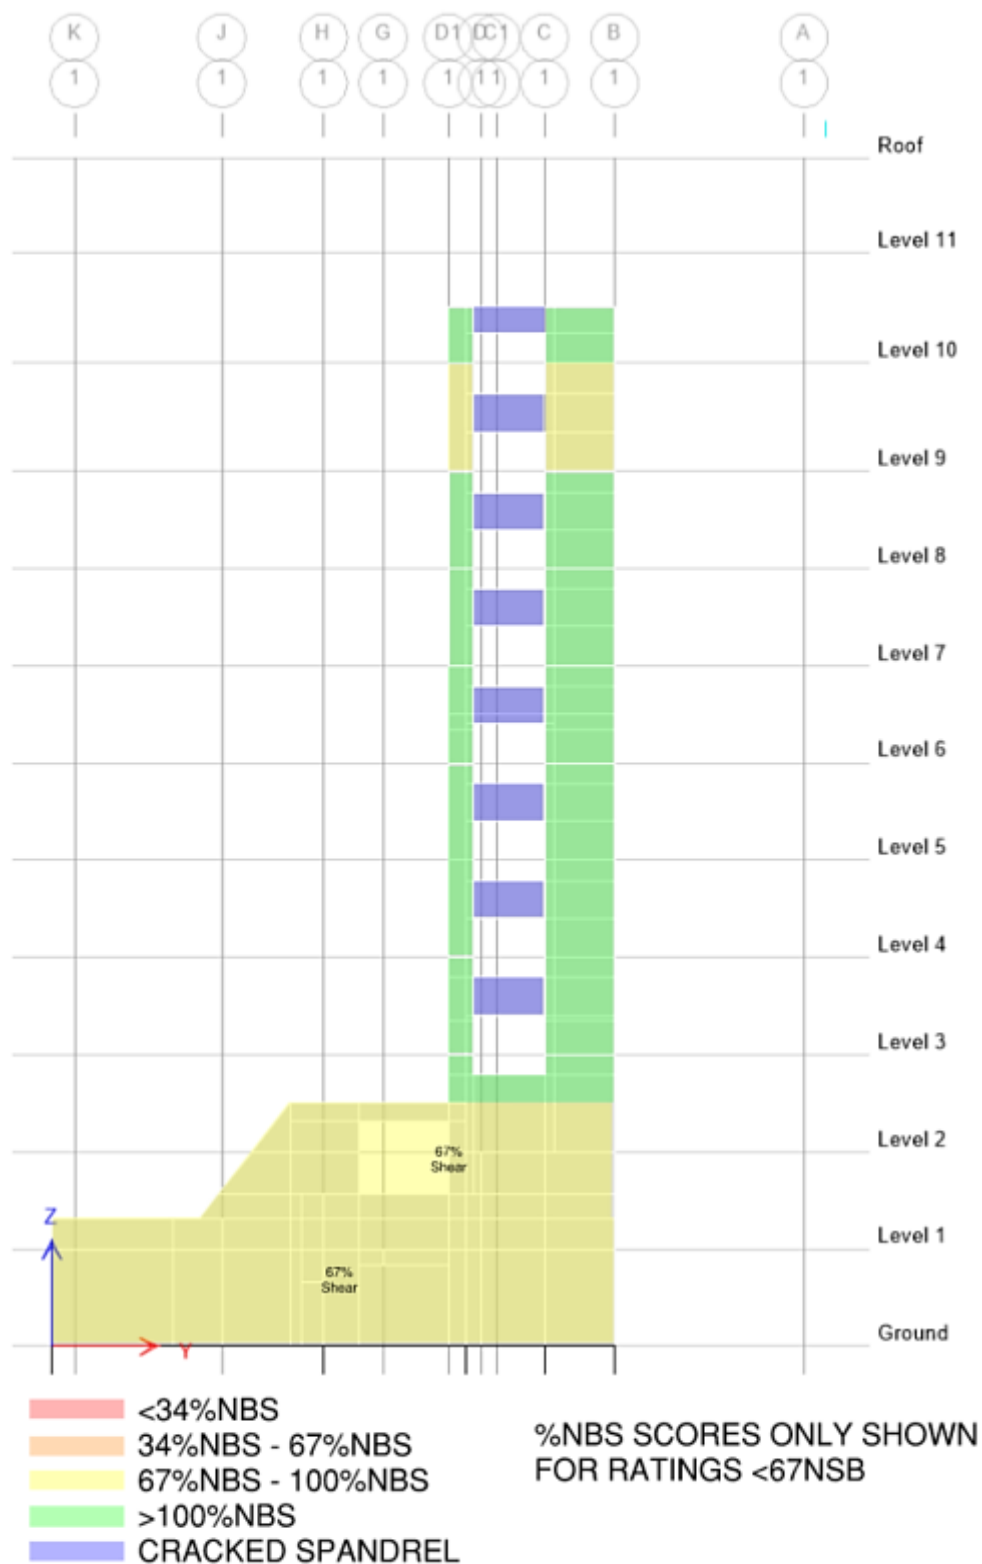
, Gridline 1 Transverse Direction Wall – North Structure
